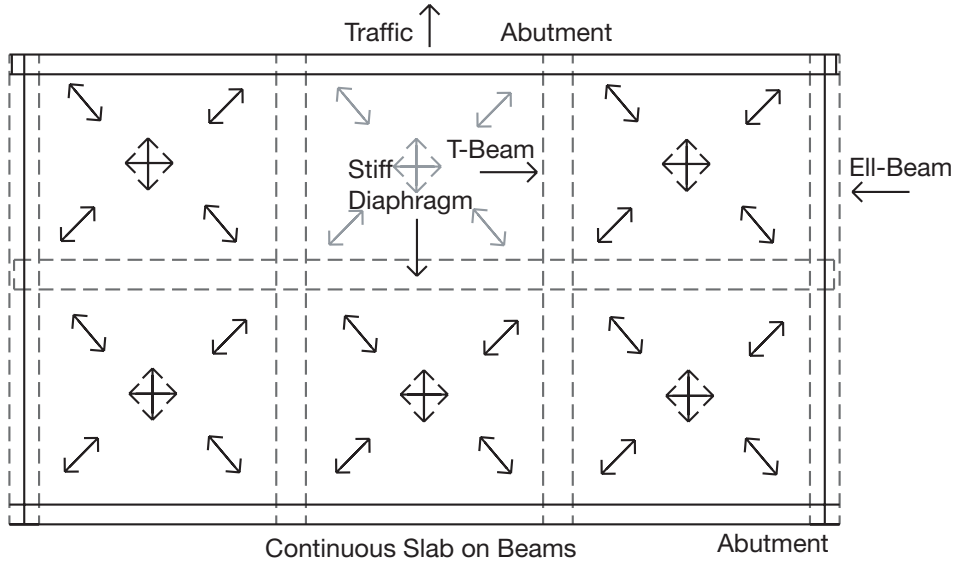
Dome or arching actions at boundary of continuous deck slabs (biaxial and diagonal bending).
